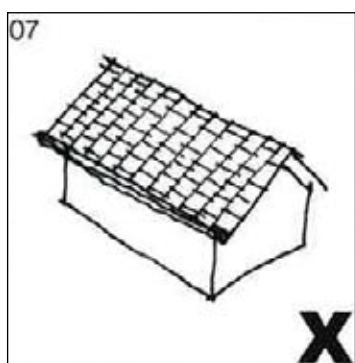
(k): Metal roofs with a pitch equal to or less than 30 degrees are encouraged.(l)
